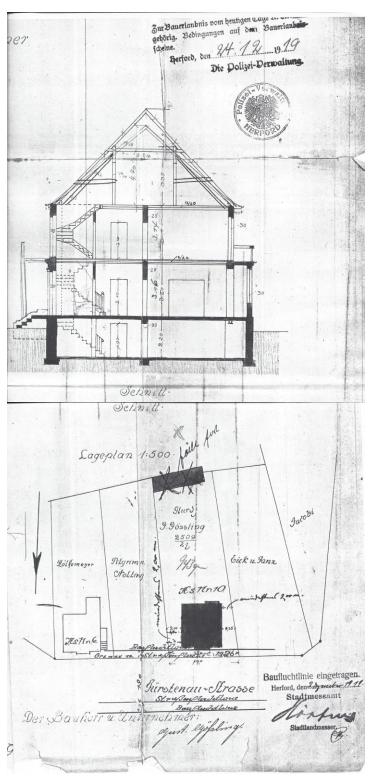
Part of the house and lot plan Gustav submitted in 1919
